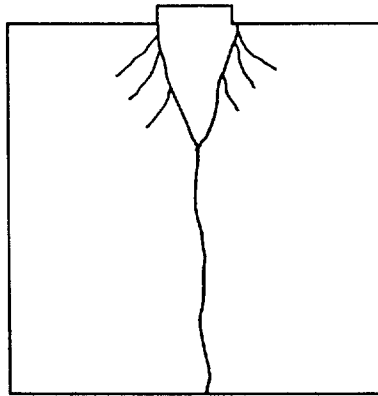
Main fracture pattern of strip punch test (at point B of Figure 3.3.1.14)
